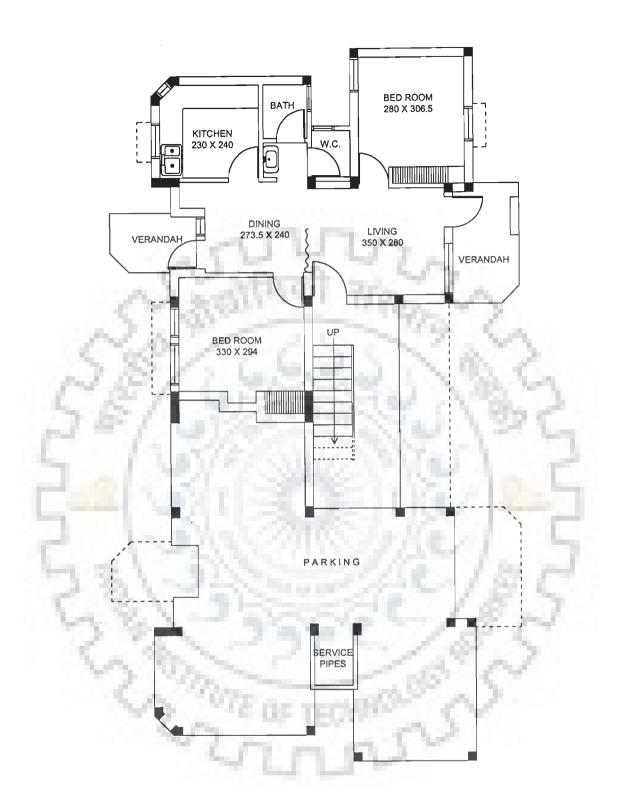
(b) - Typical Floor Plan of Type A-A, Project No. 14
